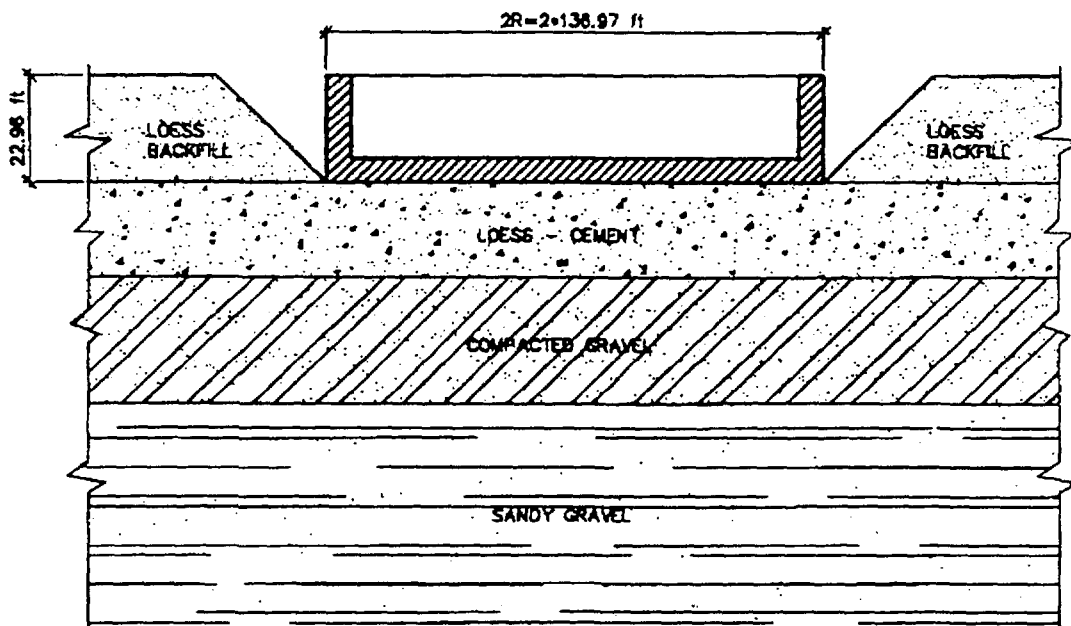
SUPELM Analysis Foundation Model (Unbonded Wall)
